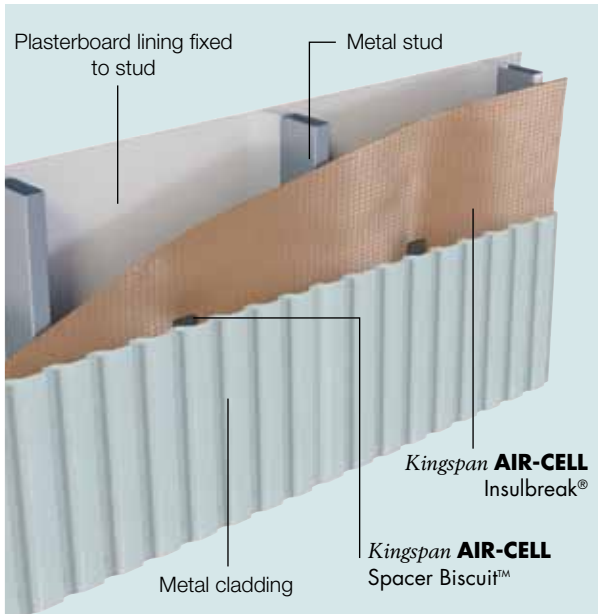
Kingspan AIR-CELL Insulbreak® on steel-framed wall
